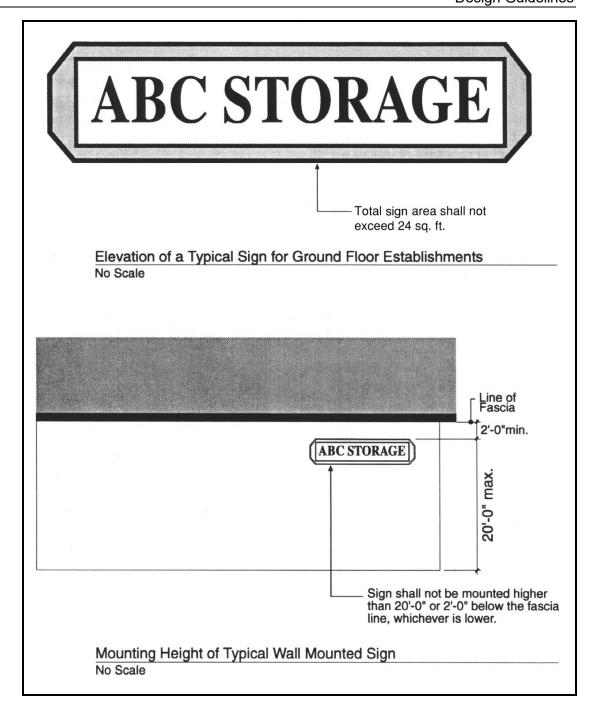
Typical Ground Floor Sign Size and Mounting Height
